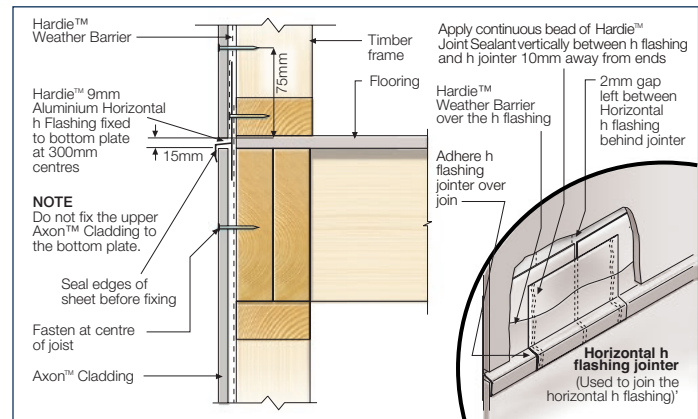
UPPER FLOOR JUNCTION OPTION 2
